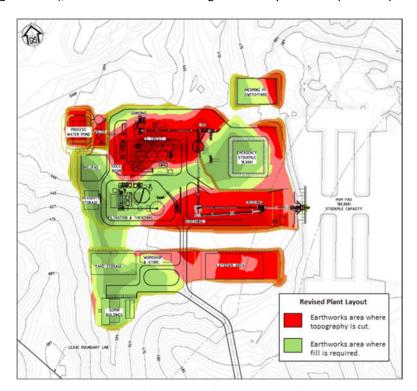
Revised plant layout (Wave 2020) with a smaller footprint and relocated. Note high load structure located on 'cut' areas (in red) rather than areas of infill.
